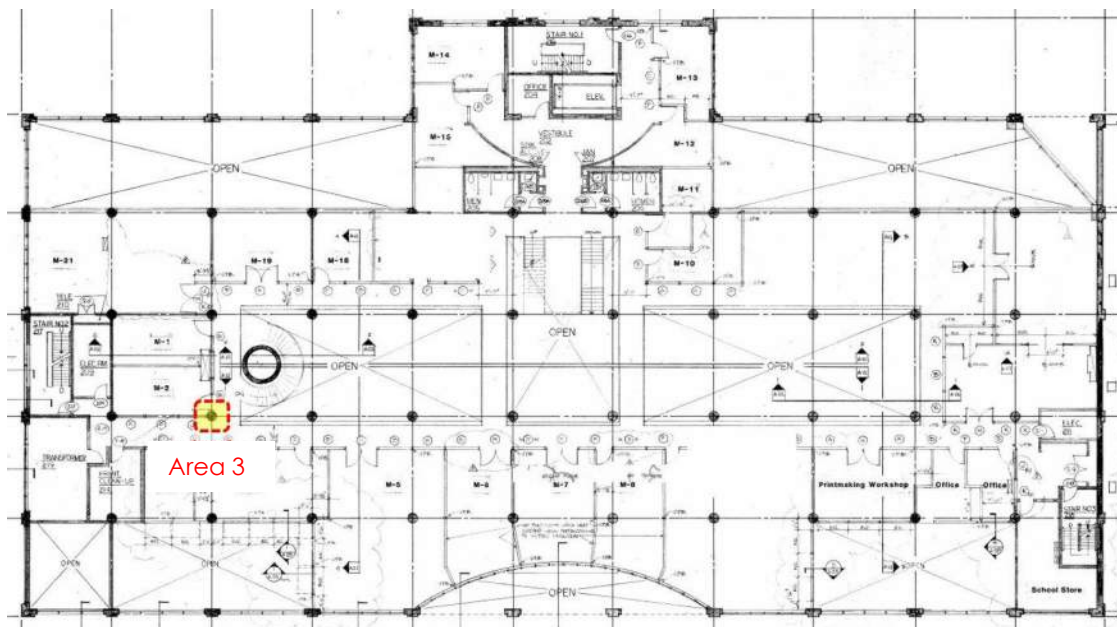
Mezzanine Floor Plan – Showing Area 3 Assessed by CBZ
